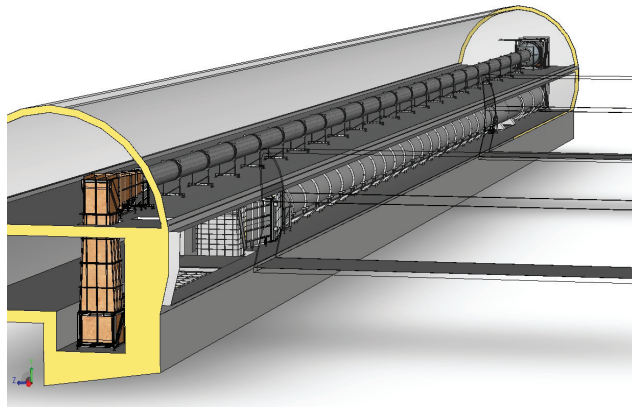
Overview of the Long Pipe installation inside the Caproni underground tunnel.
